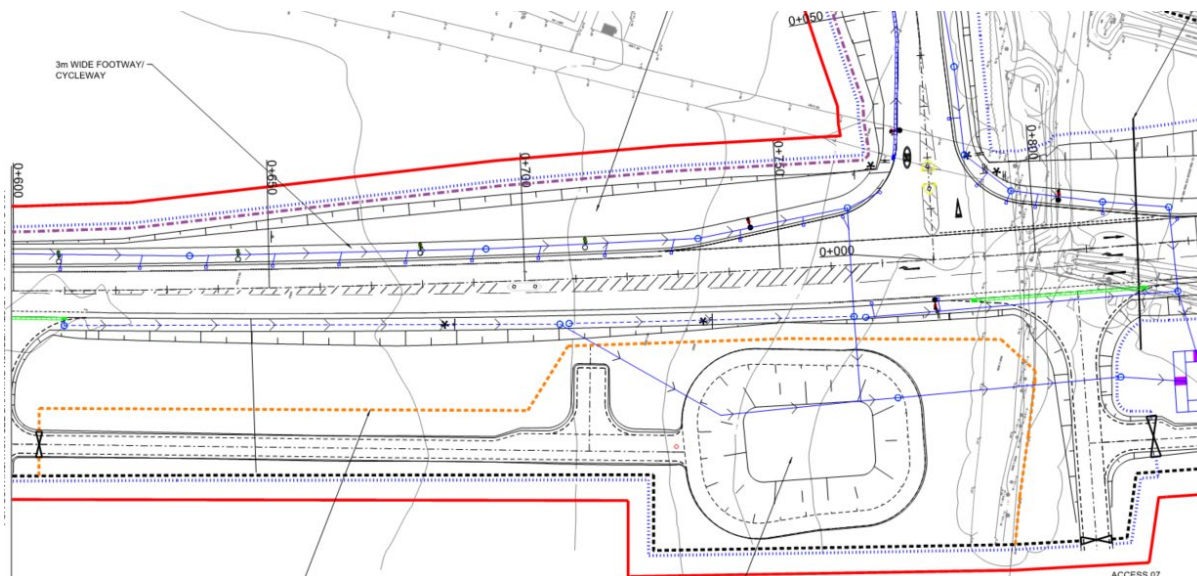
Extract of drawing 0192⁴ showing the access track and dry attenuation pond.
